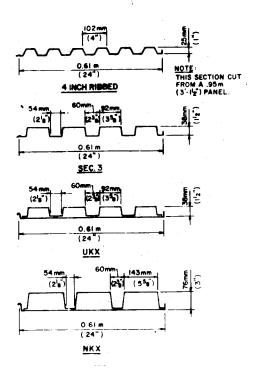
Cross Sections of Cold-Formed Steel Panels
